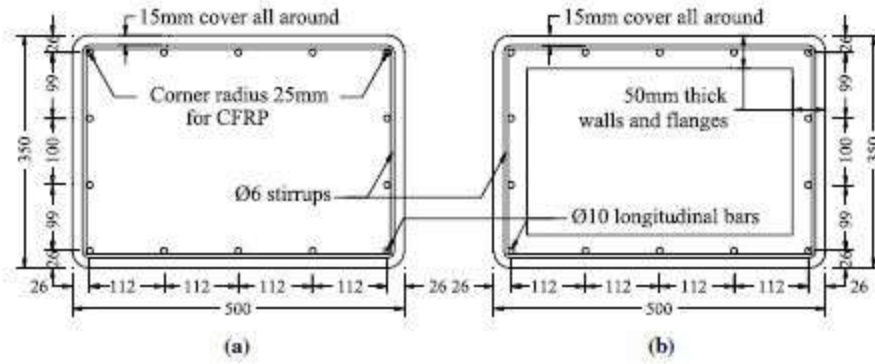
Reinforcement details of the tested specimens: (a) solid section and (b) hollow section¹⁹
